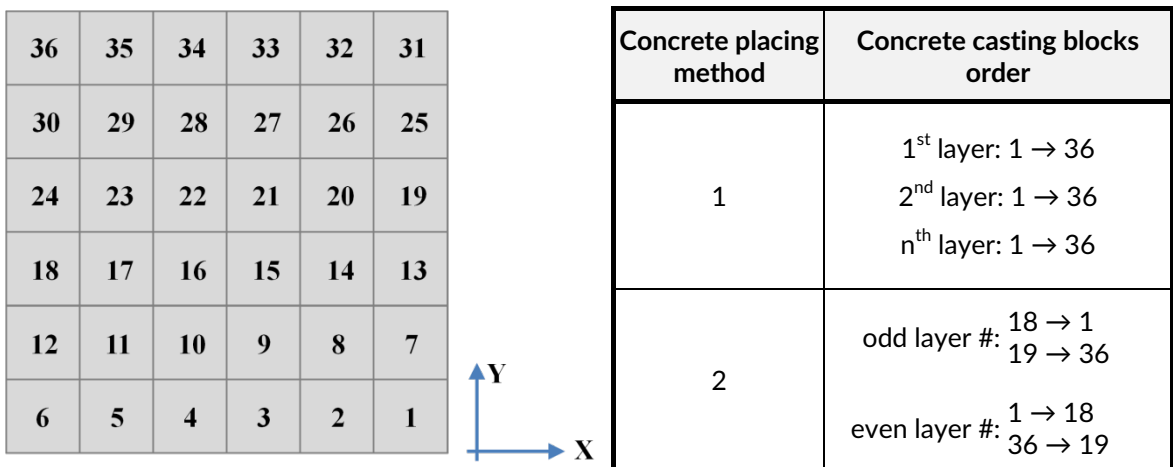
Numbering of the concrete casting blocks on formwork surface.
